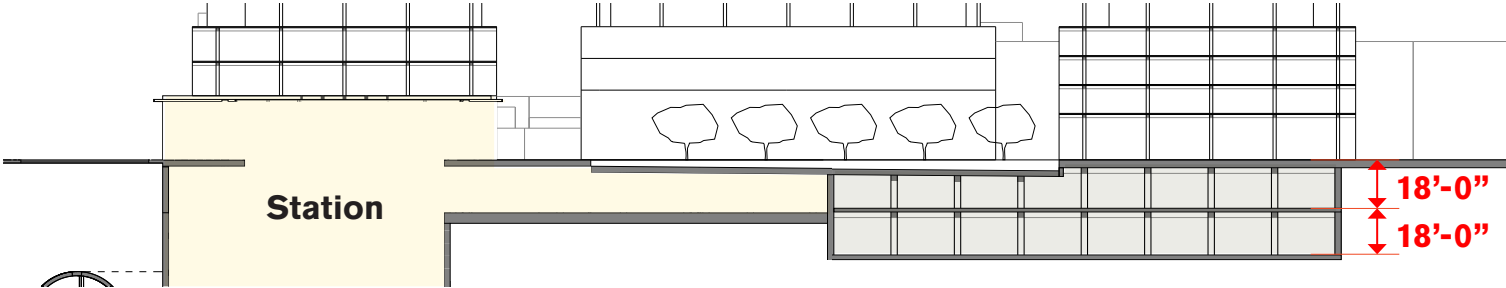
Alt. Floor to Floor : 18' - Double Car Stackers
